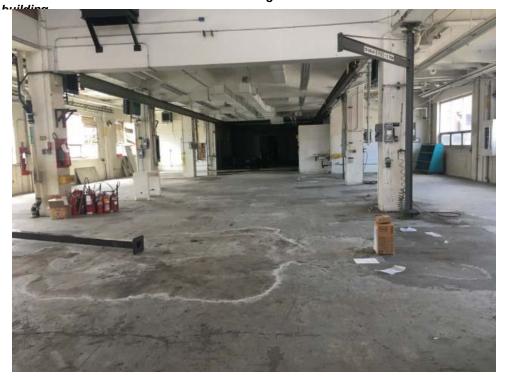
Looking east at the former equipment maintenance workshop on the main floor of the 556 Booth Street building.
